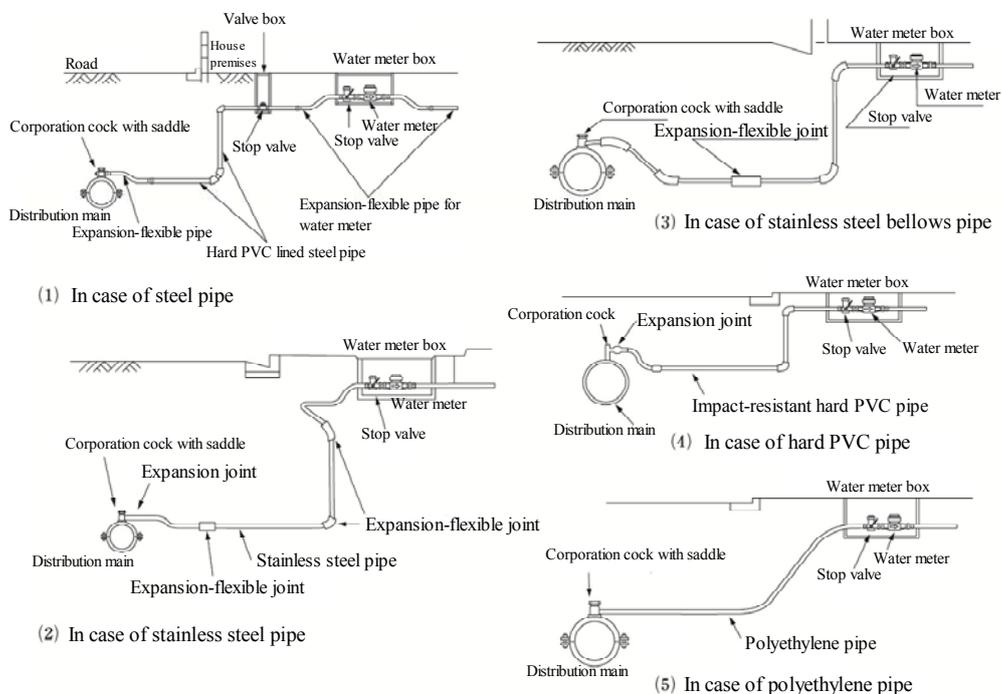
Example of branching from the distribution main and pipe laying
